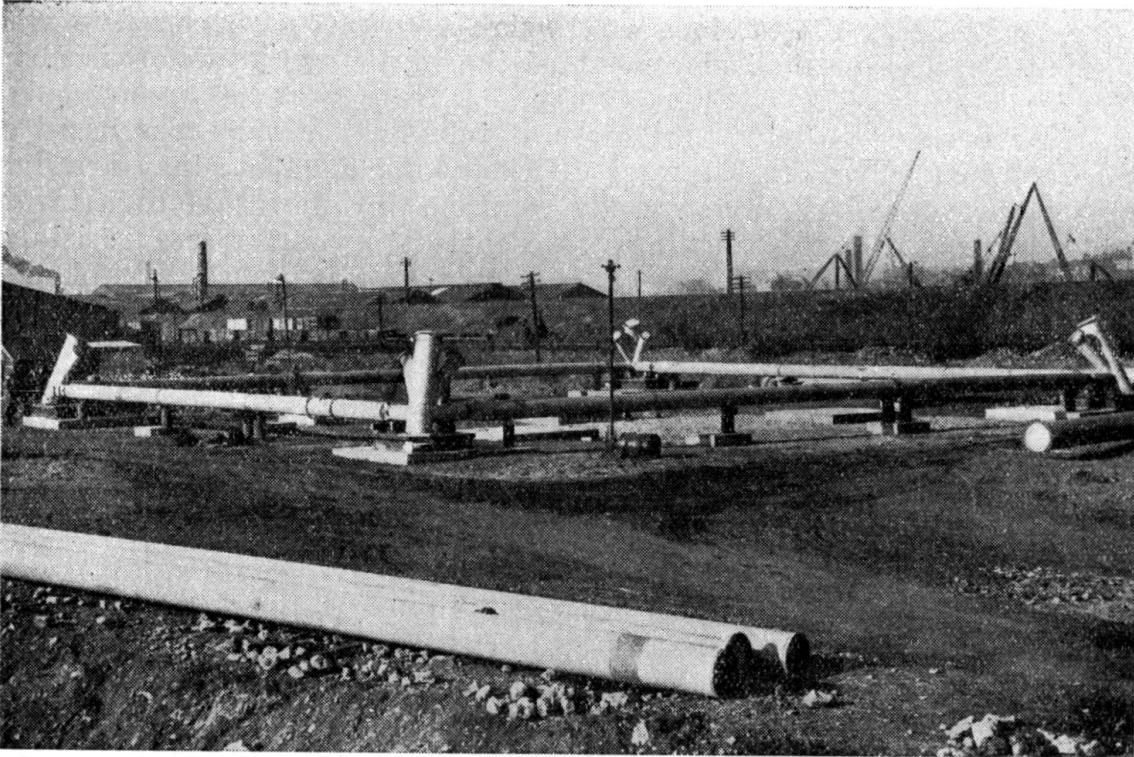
Base unit of Tower erected at Messrs. Tubewrights' trial assembly site
